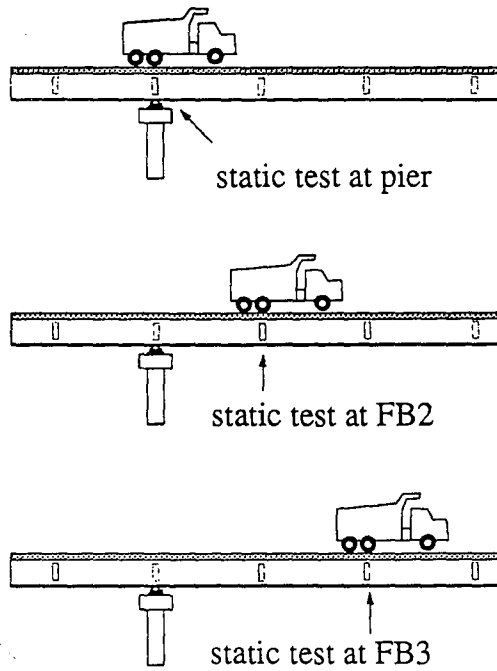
Dump Truck Positions Over Floorbeams During Static Tests
